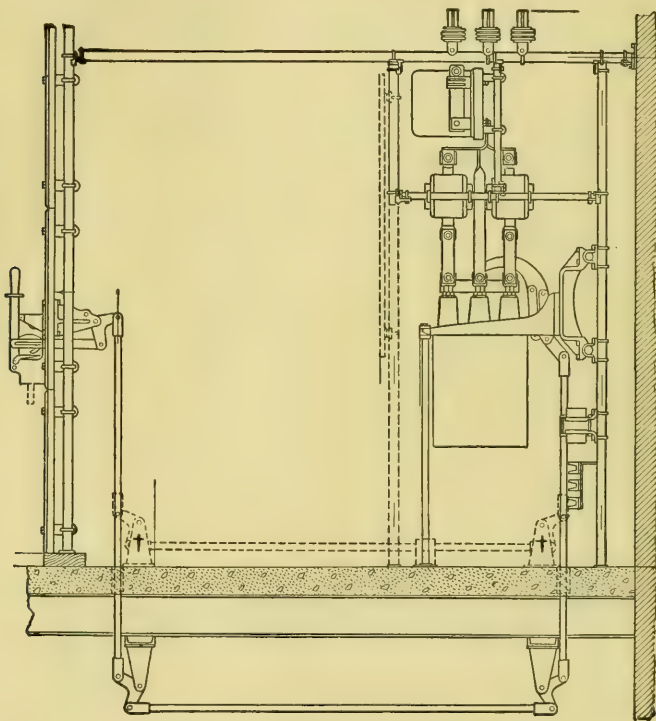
Arrangement of 2300-volt Switchboard with Mechanically Remote-control Circuit Breakers Mounted on Open Pipe Work.
